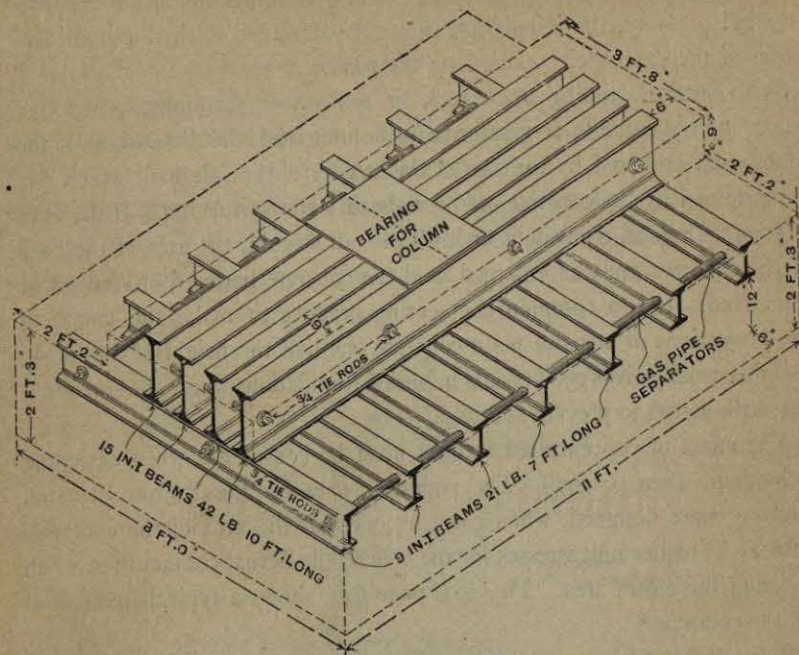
Concrete and I-beam Footing. (See p. 643.)
